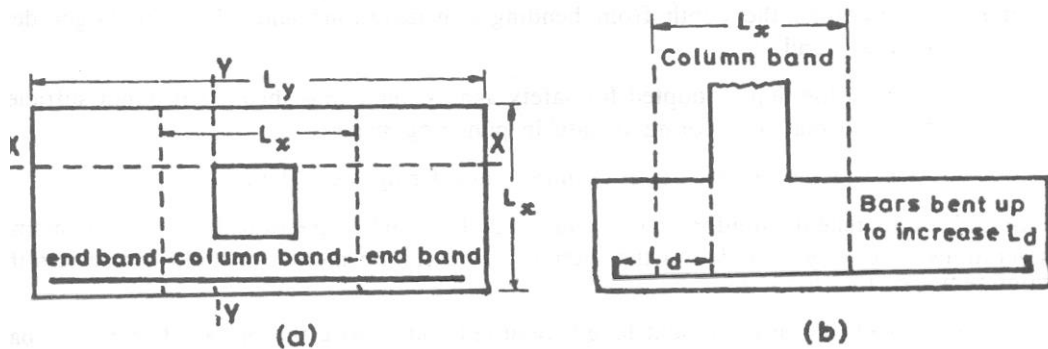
Placement of steel in isolated footings: (a) Central column (plan); (b) Non-central column (elevation).
